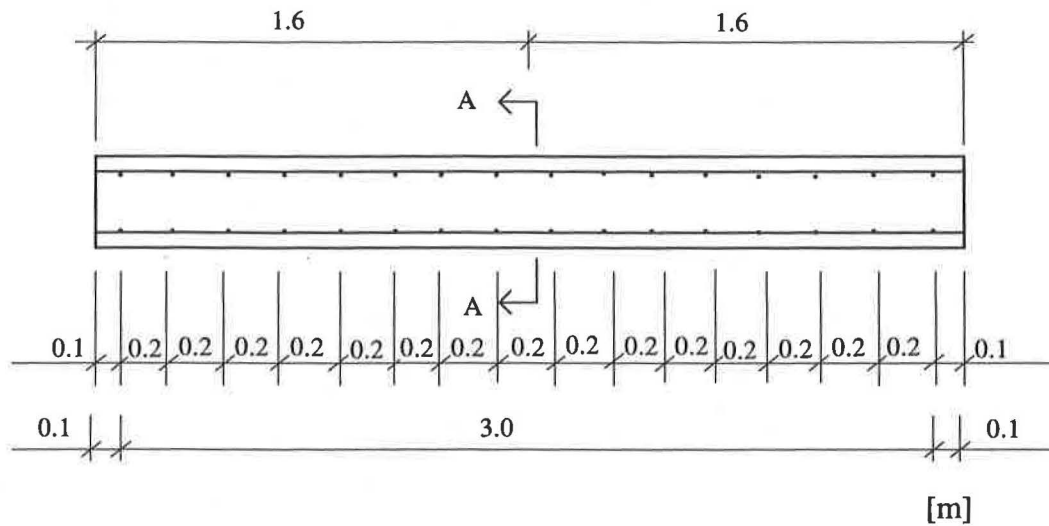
Reinforcement detailing of specimen RV15 (side elevation).
